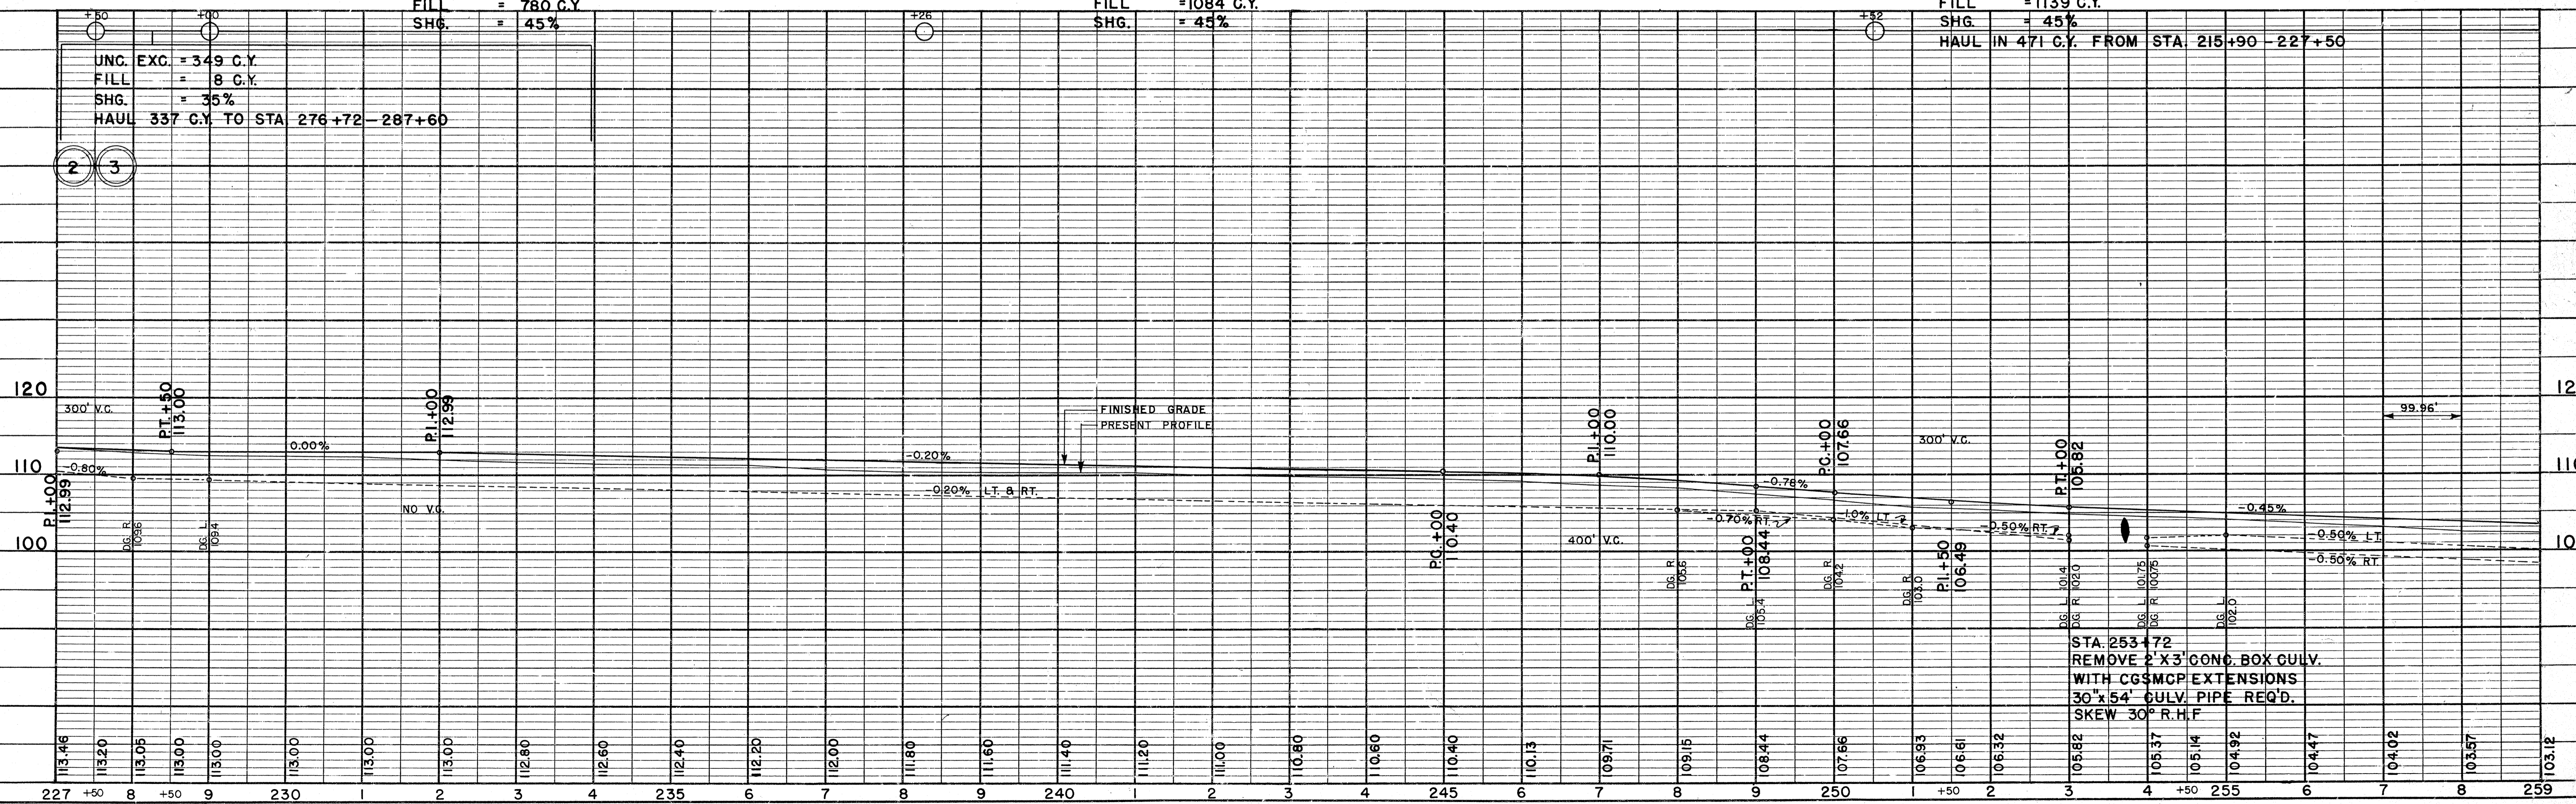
PLAN-PROFILE O.P.R.A.E. STANDARD
